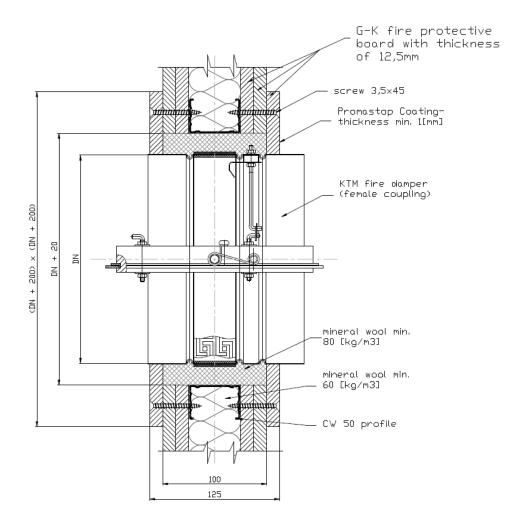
Installation of KTM fire damper (female coupling) in light wall barrier
